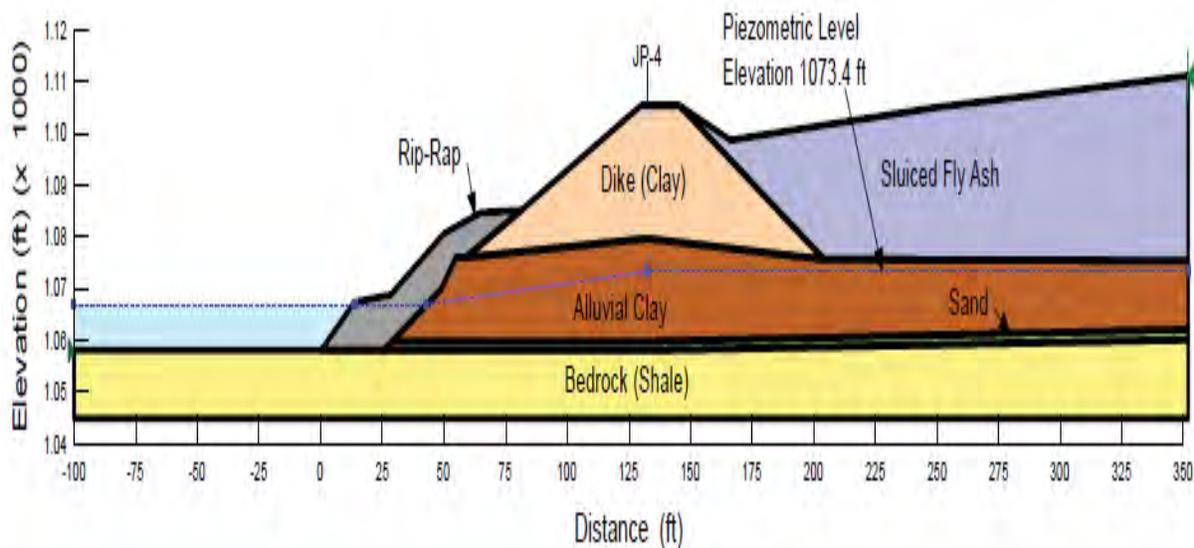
Typical Ash Disposal Area J Cross Section (West)
